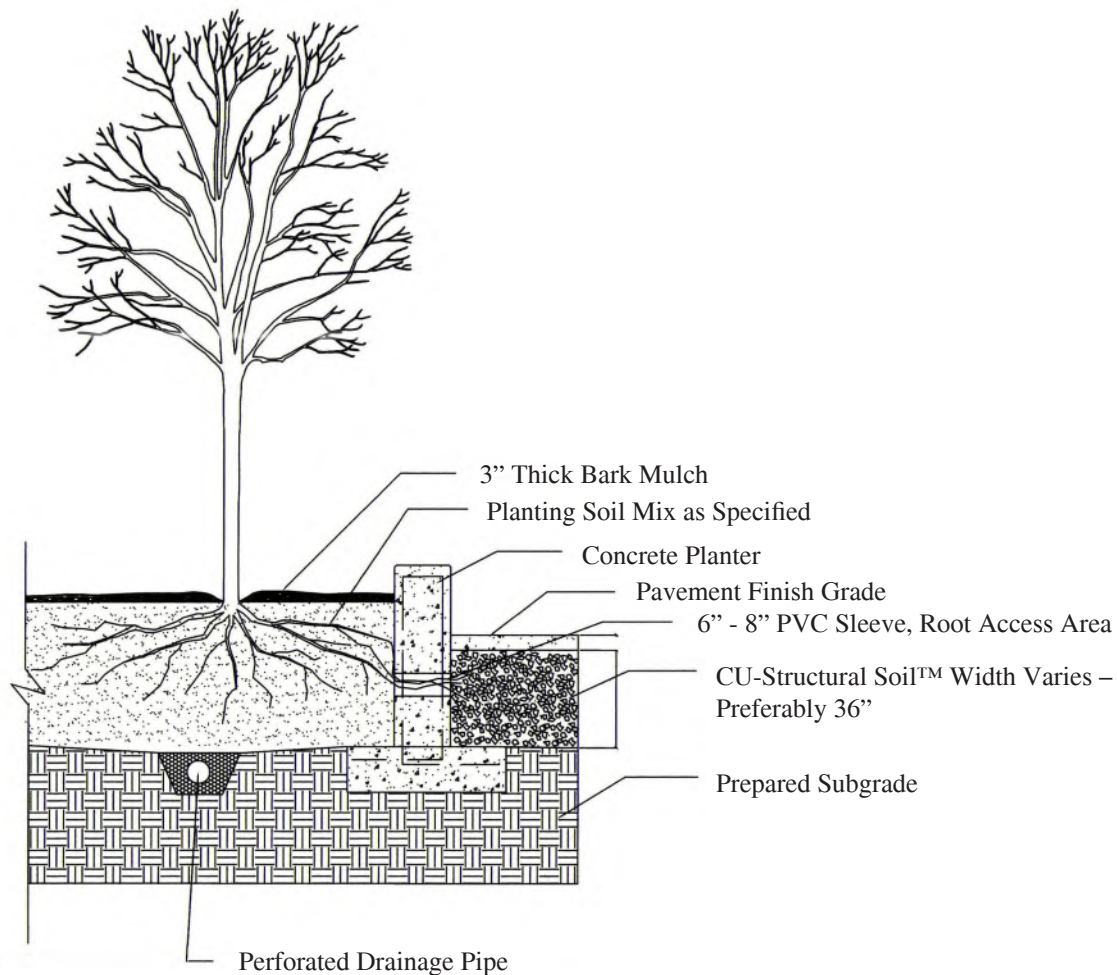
Limited soil volume planter with root access into CU-Structural Soil™ under plaza pavement
